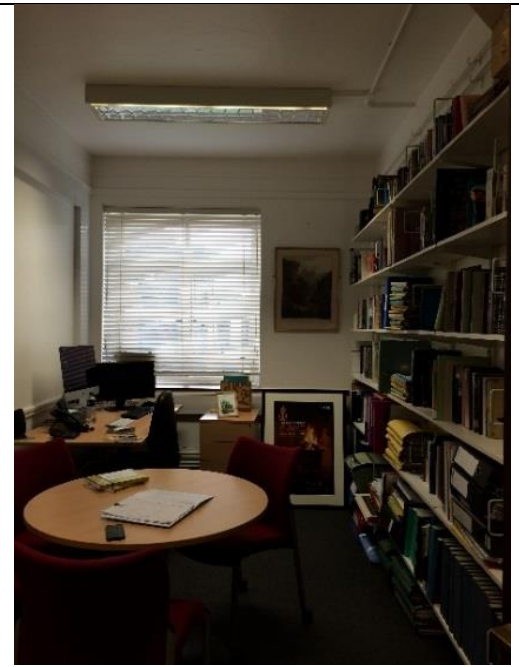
existing left hand side office, proposed doorway to right hand side wall where shelving is located
